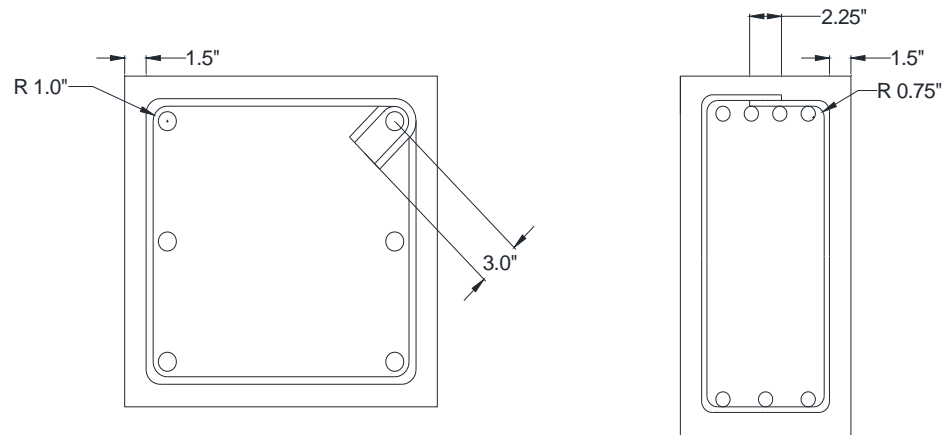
Transverse reinforcement detailing for full scale frame
